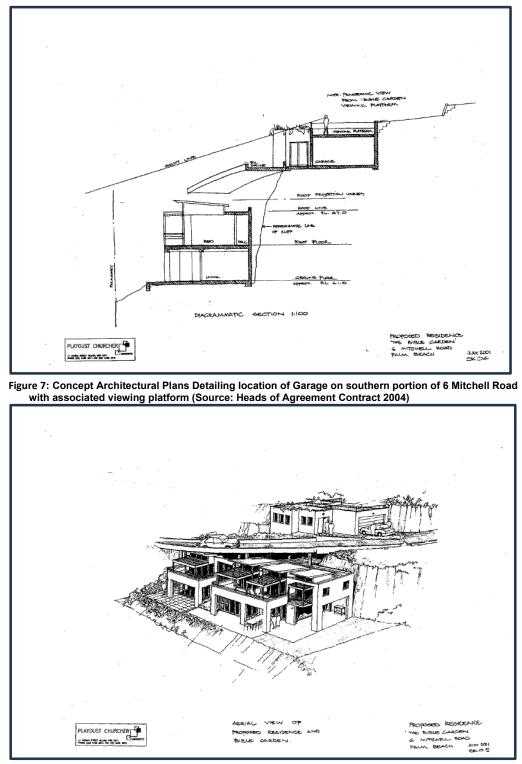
Concept Architectural Plans Detailing location of Garage on southern portion of 6 Mitchell Road with associated viewing platform (Source: Heads of Agreement Contract 2004)
